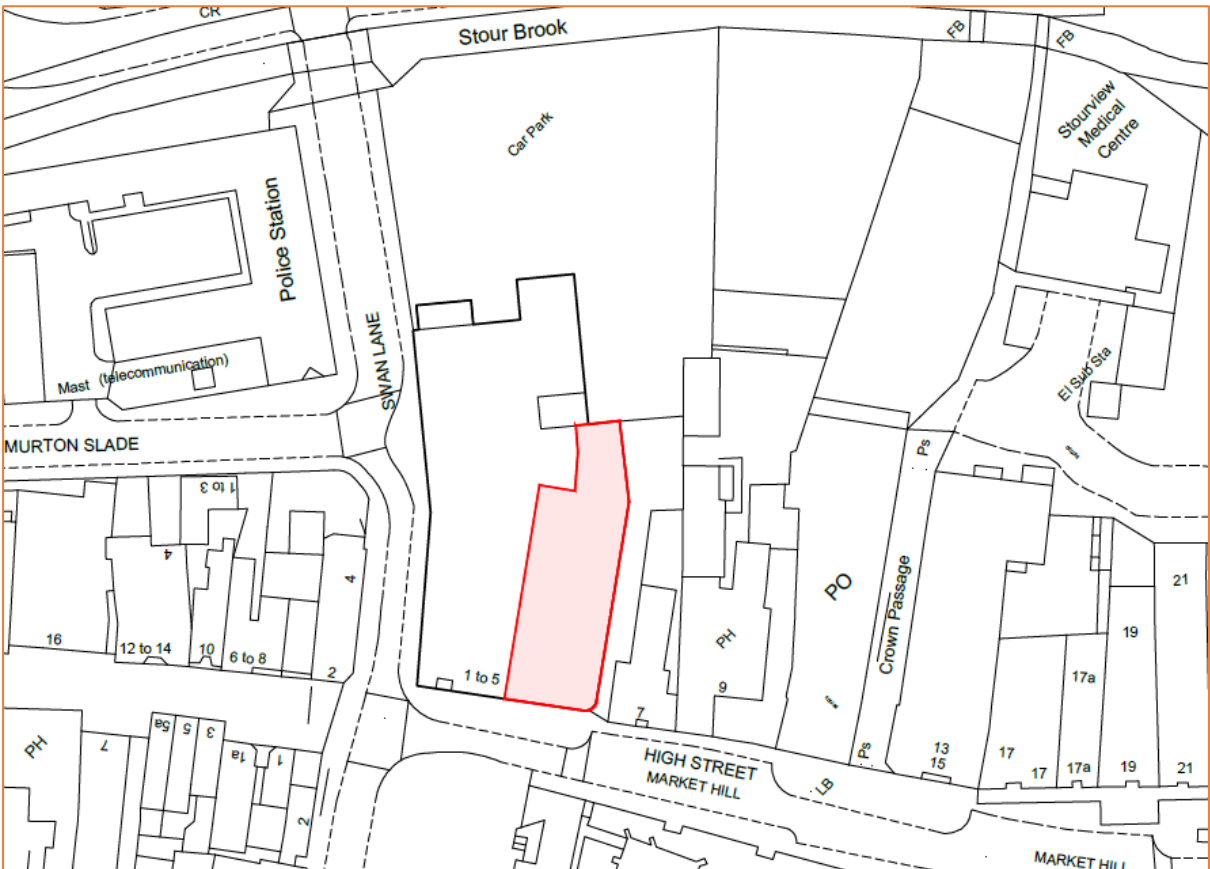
Site Location Plan (Source: Fairhome Property Developments Ltd)
